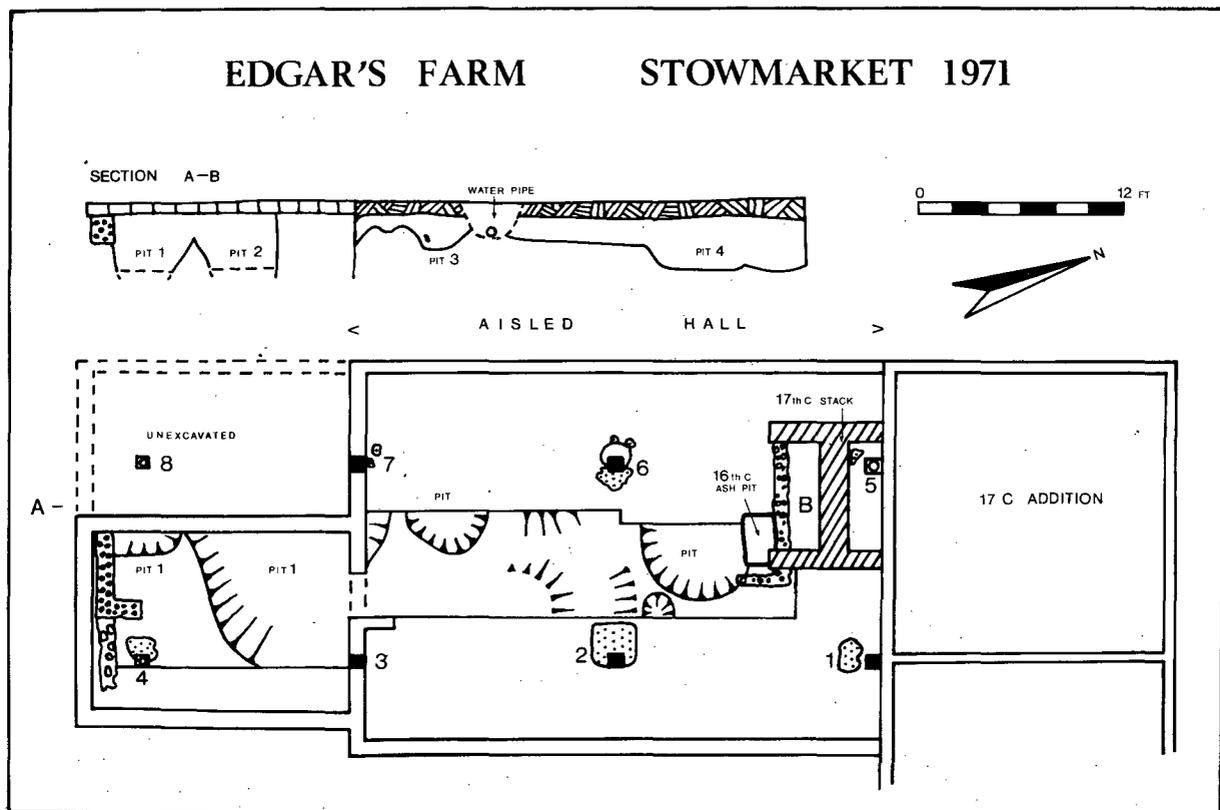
EDGAR'S FARM, STOWMARKET: Ground plan.
